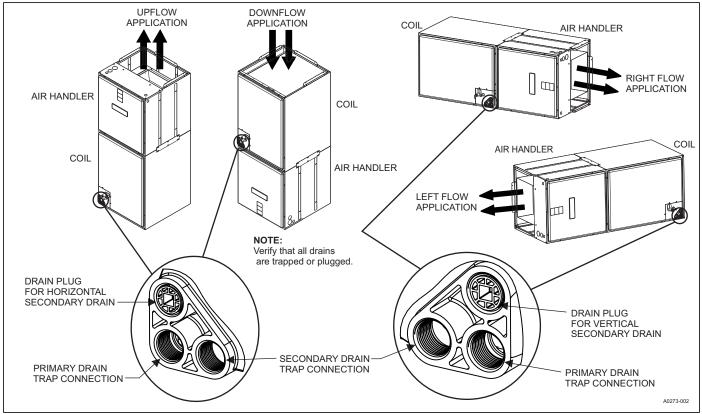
Location of Coil Trapped and Plugged Drain Connections with Modular Air Handler
